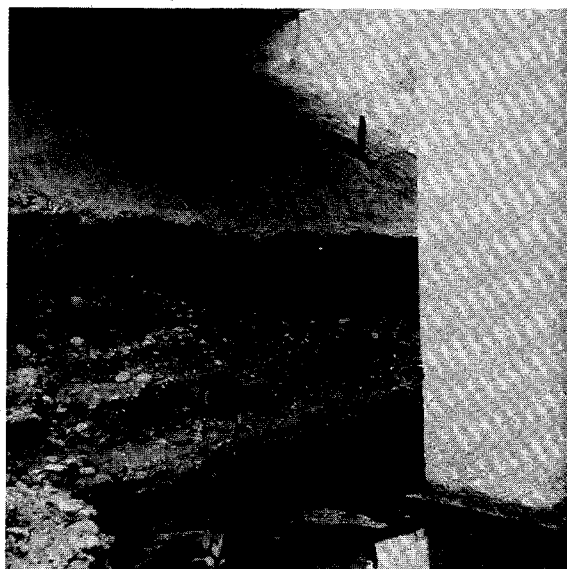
View in 1976 of erosion of concrete slope paving at left abutment, Hollywood Crk, 1976.
